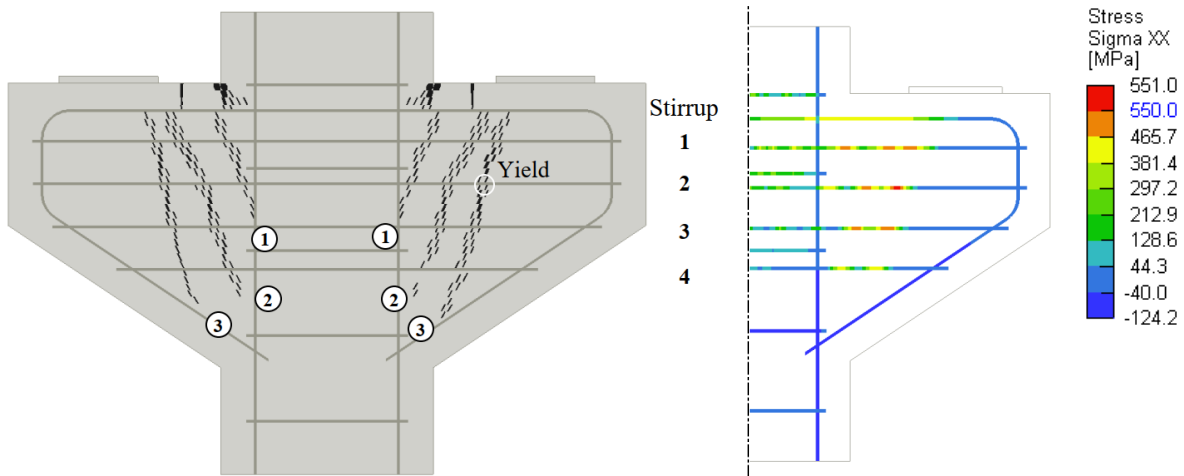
Crack model and reinforcement stresses at a vertical load of 745 kN.
